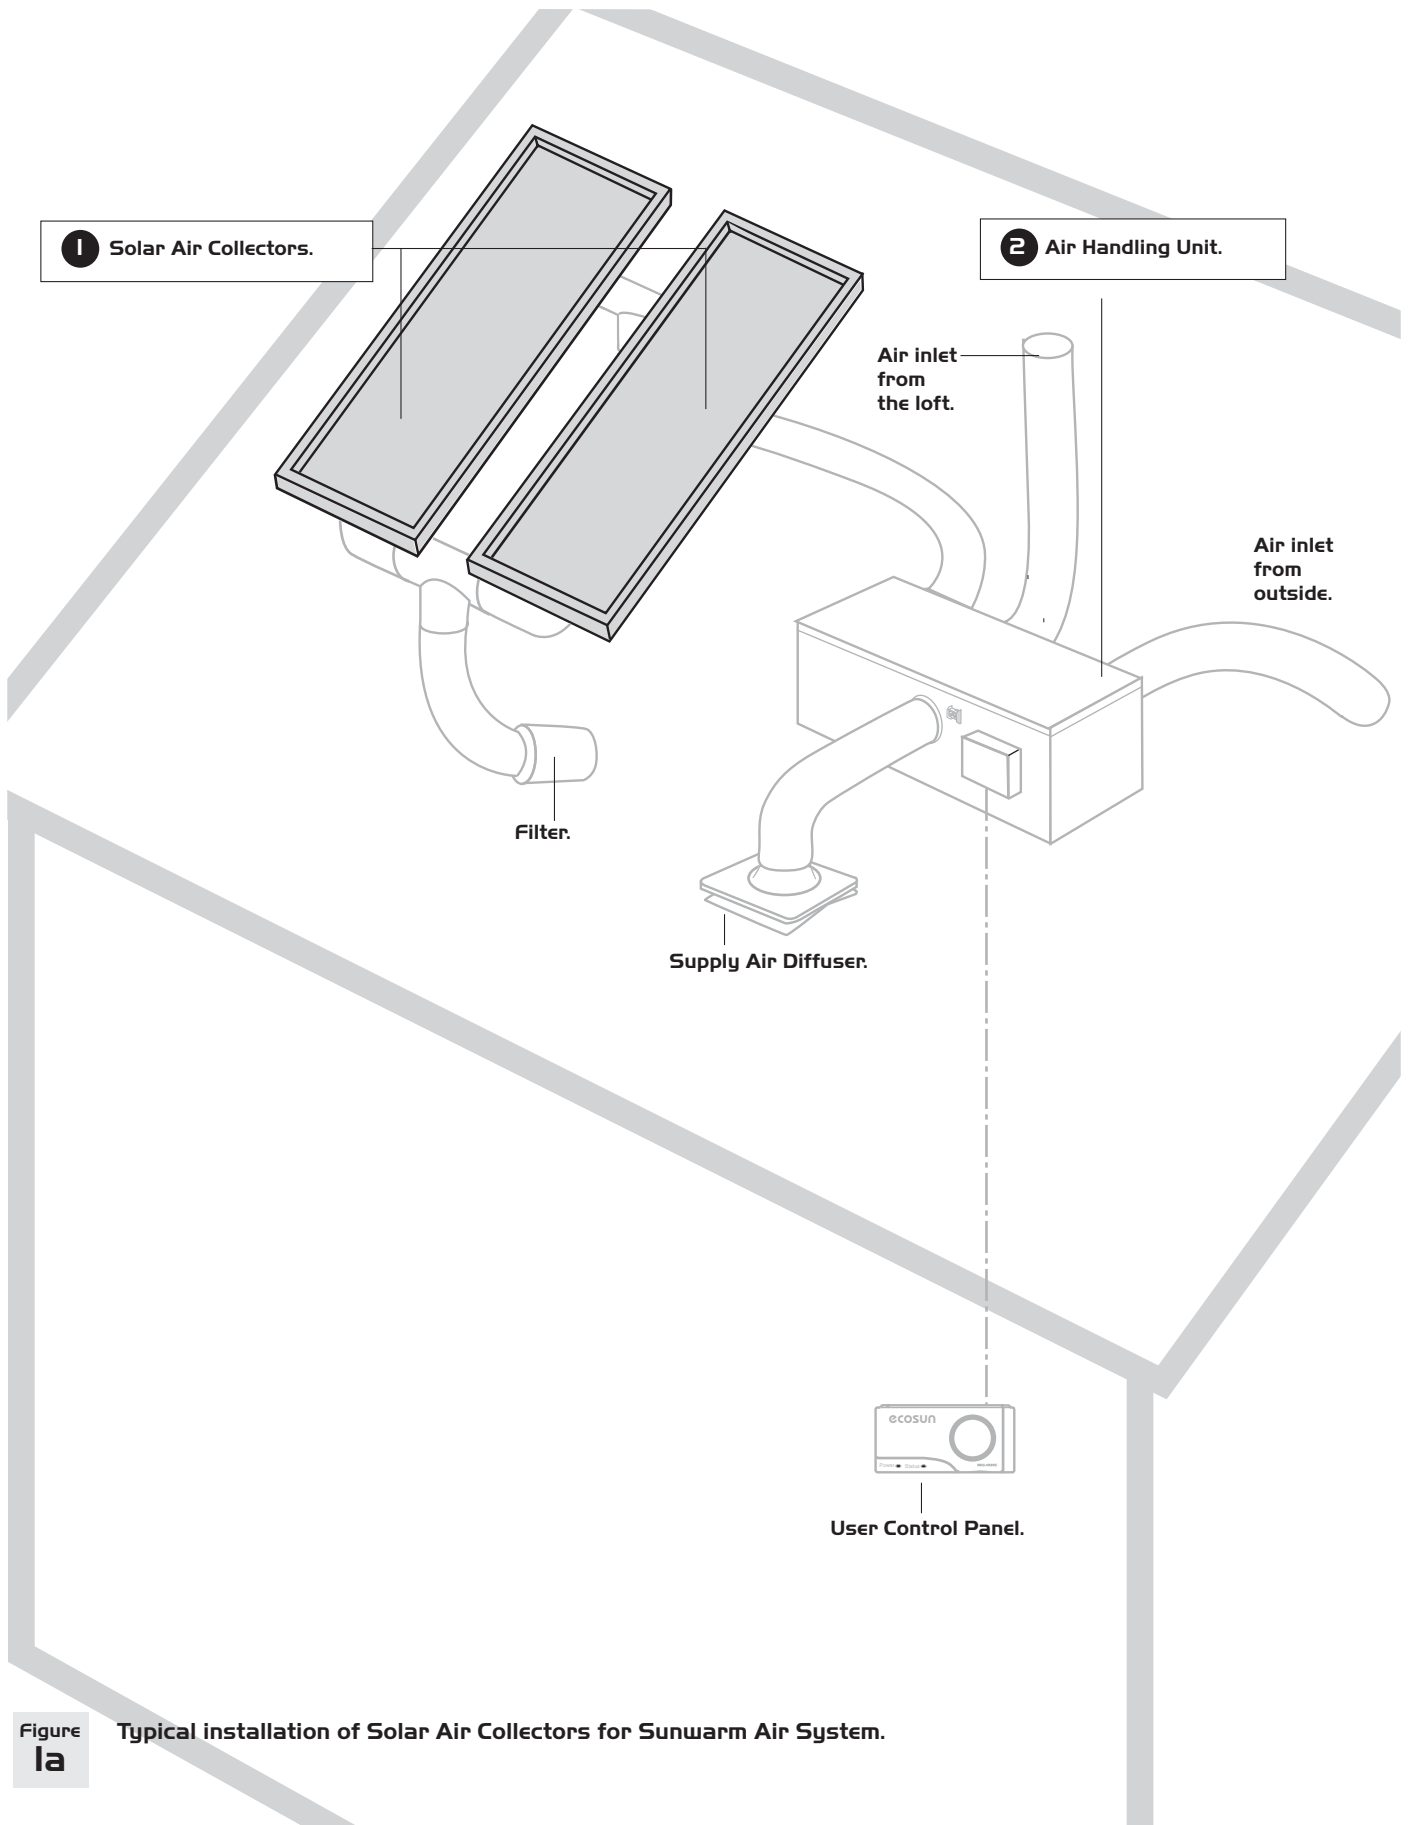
Typical installation of Solar Air Collectors for Sunwarm Air System.
